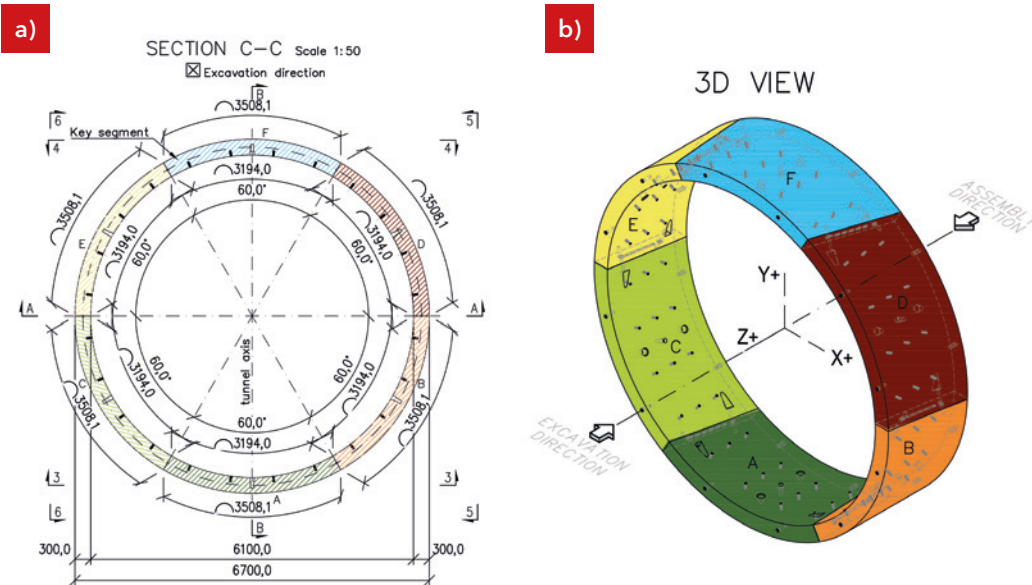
Segment rings, dimensions of the segments, detail (a), 3D model (b) [7]
